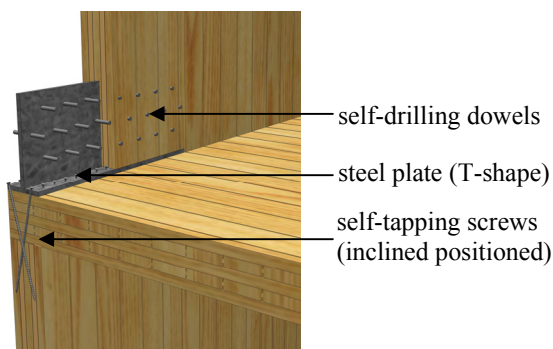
Dowel-type connection with steel plate in between the wall element [7]
